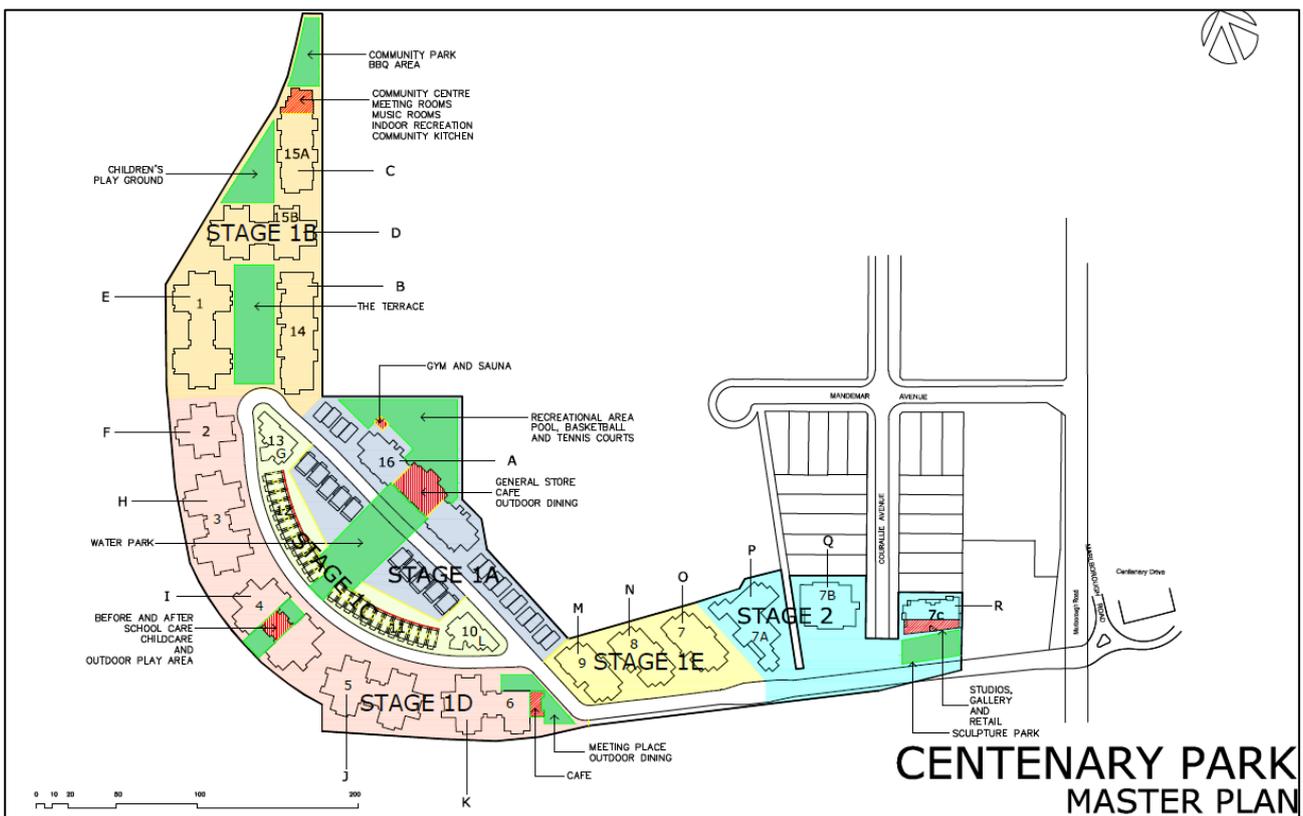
Diagram of Centenary Park Complex. The proposed strata subdivision is specifically in relation to car parking and storage spaces within Building E of Stage 1B, Buildings 2,3,4,5 and 7 of Stage 1D and Buildings 7A and 7B of Stage 2.
